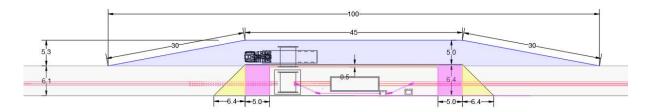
Site Layout – Side-loader trailer (Delivery)
